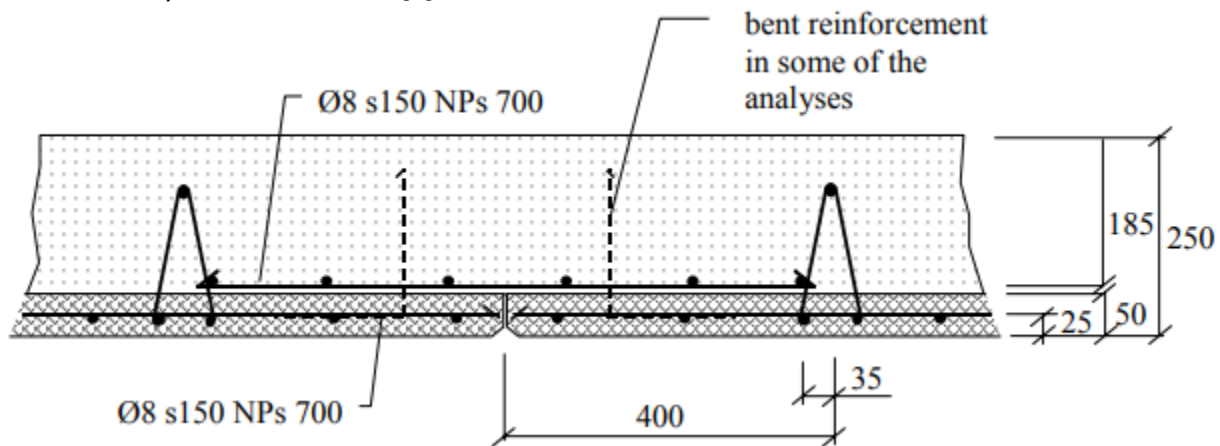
Modelled joint of the lattice girder system (K. Lundgren, 2003)
